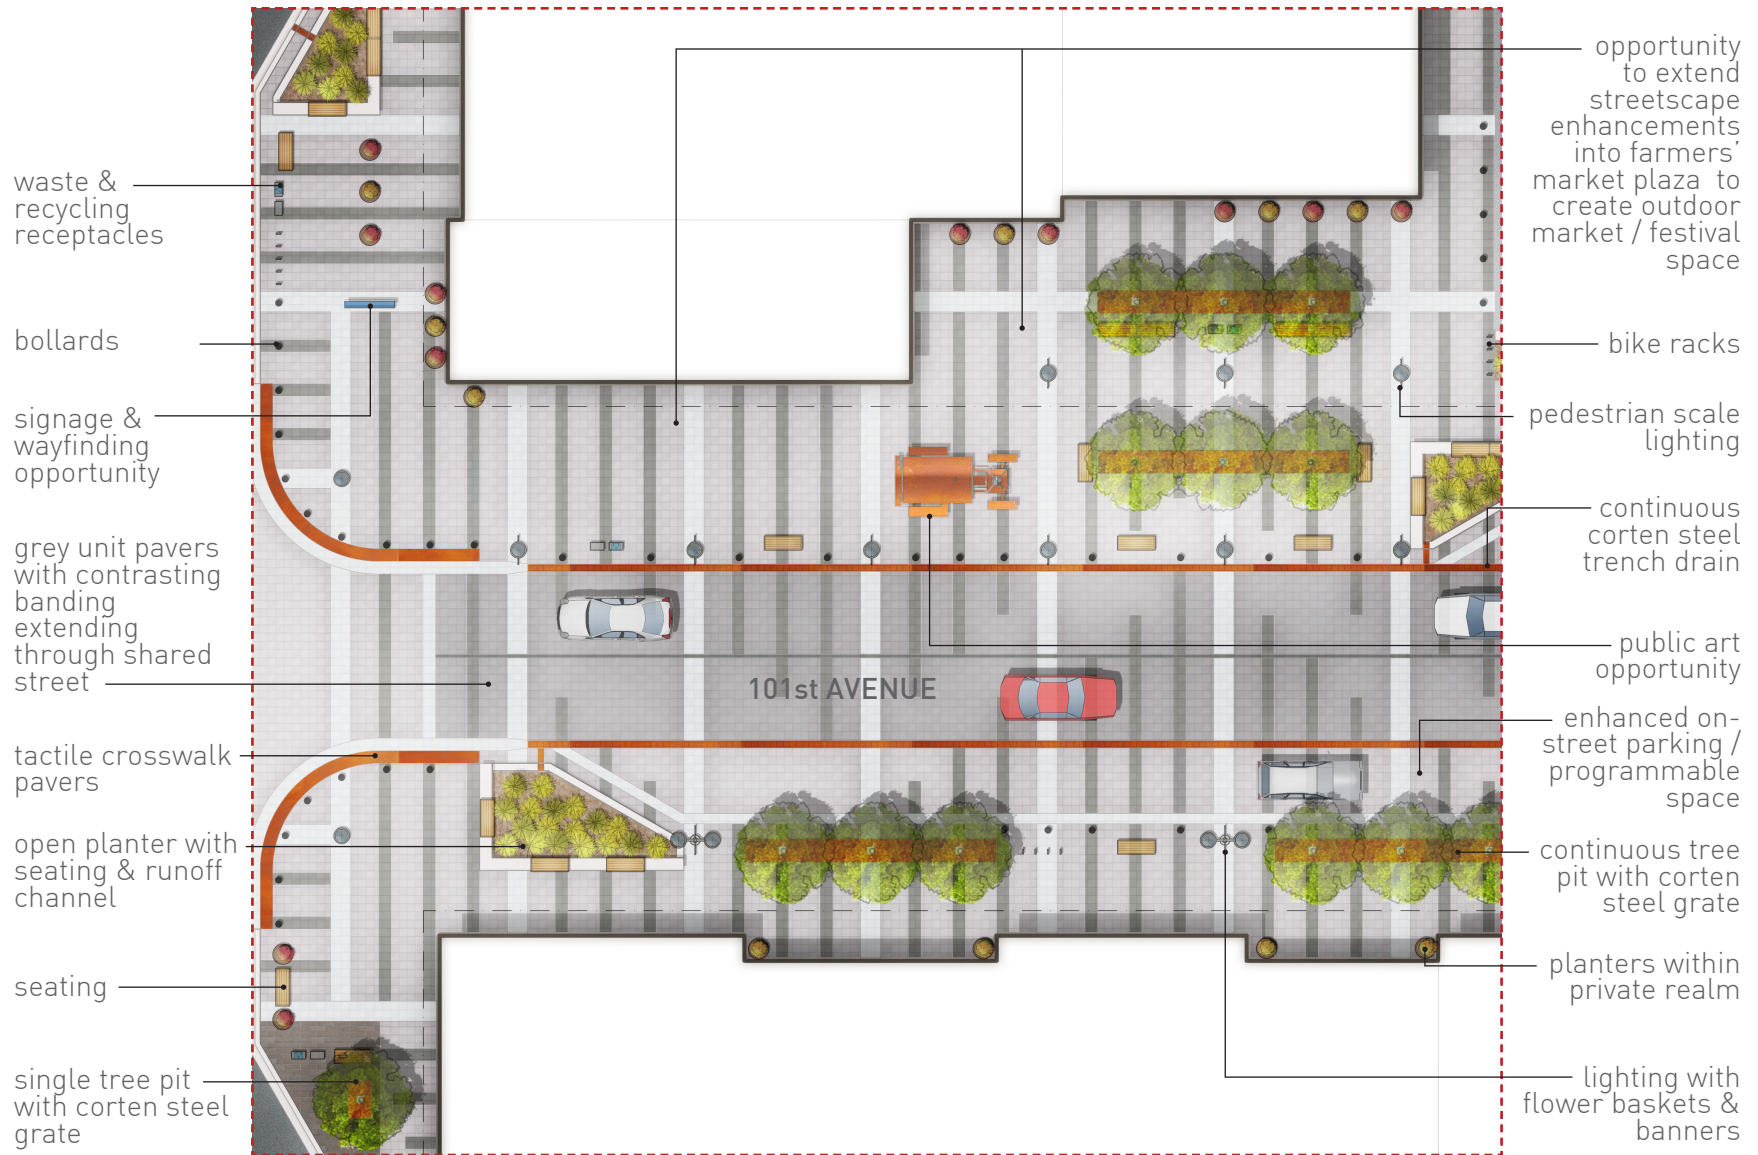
Shared Avenue [101st Avenue] Market Plaza Demonstration Plan
